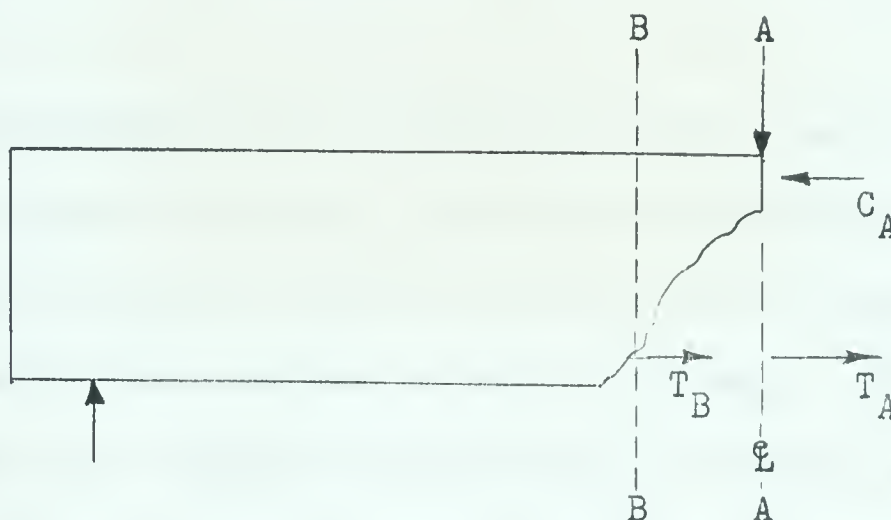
ELEVATION OF A "SHORT" BEAM LOADED AT MIDSPAN
